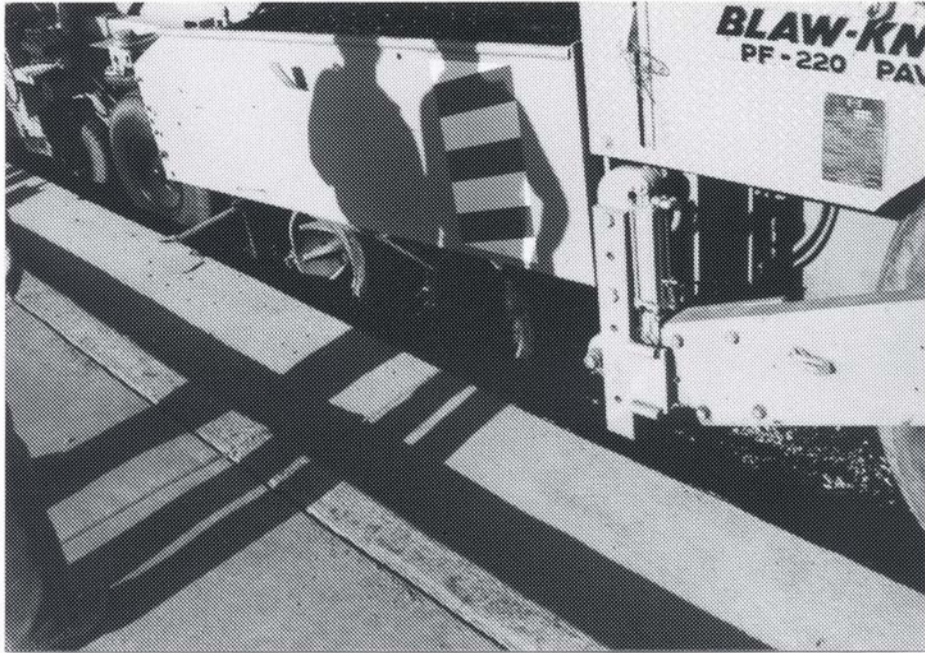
PAVER PLACING SECOND LIFT OF OPEN-GRADED SURFACE COURSE NEXT TO CURB AND GUTTER
